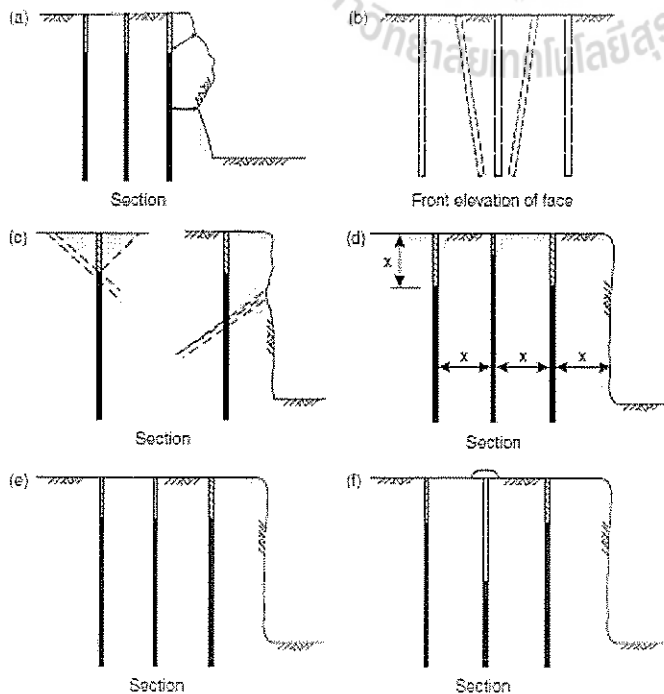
Common causes of flyrock: (a) inadequate front row burden; (b) hole misalignment resulting in concentration of explosives; (c) weak seams vent gas to rock face; (d) holes loaded close to bench surface; (e) some holes with no stemming; (f) blocked holes loaded with fixed weight of explosive or number of cartridges (after CHL, 1984).
